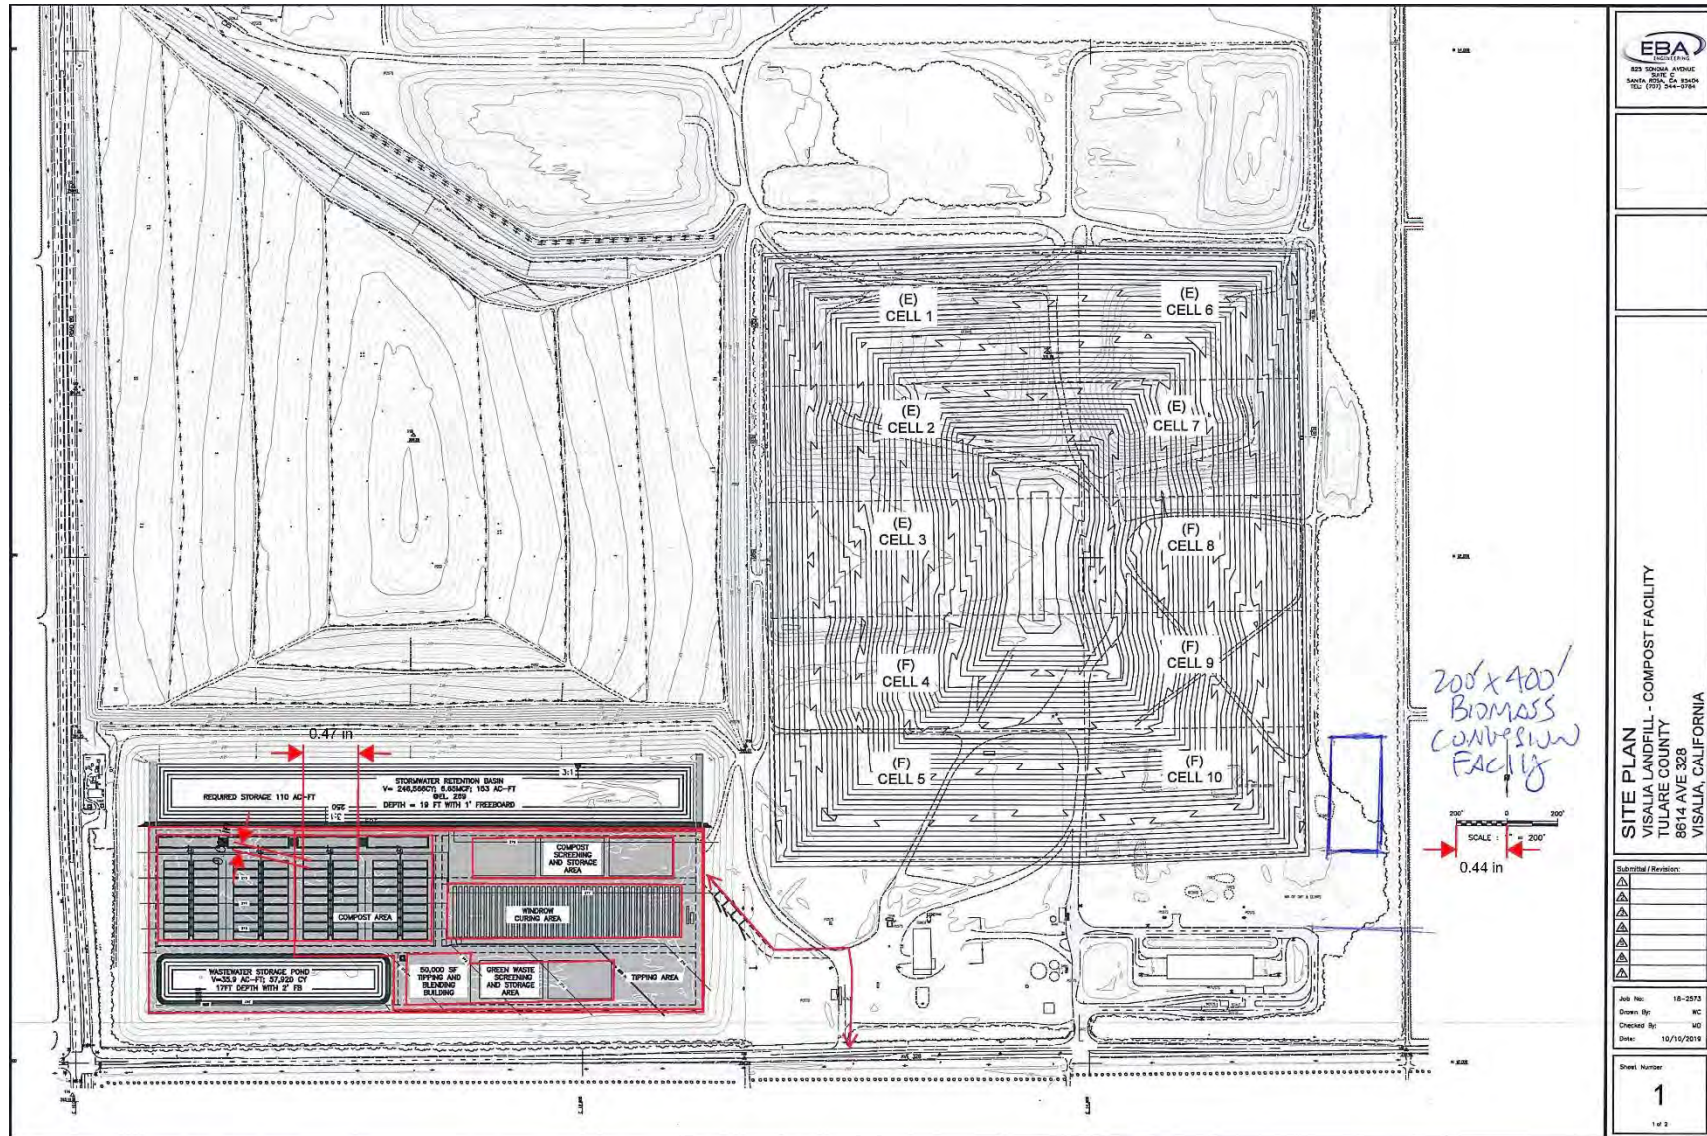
Plot Plan Visalia Landfill Facility with Compost and Bioenergy Facilities
